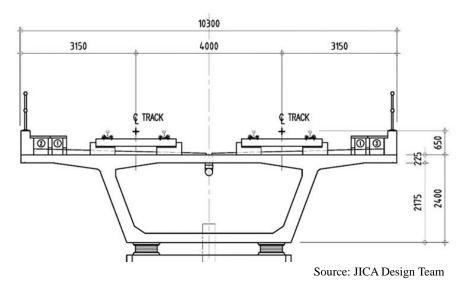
Elastic Sleeper Directly Fastened Track at Elevated Section
